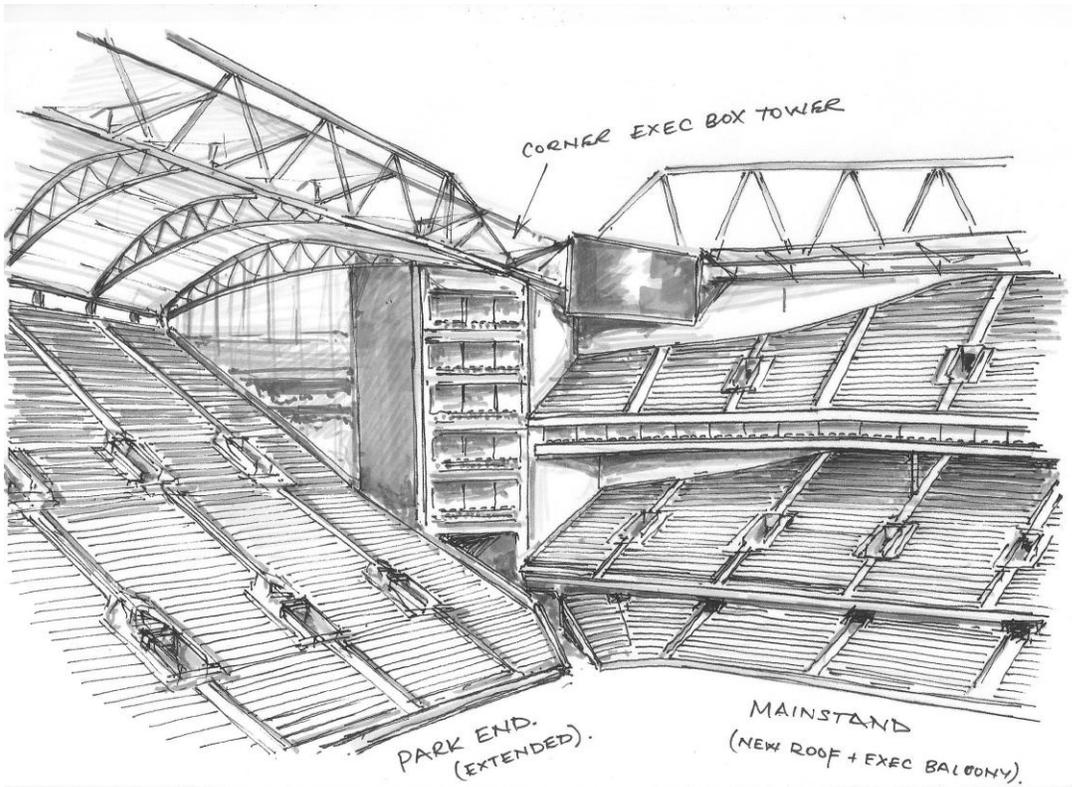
Extended Park-end Plan view showing corner section link with an extended upper Bullens.
